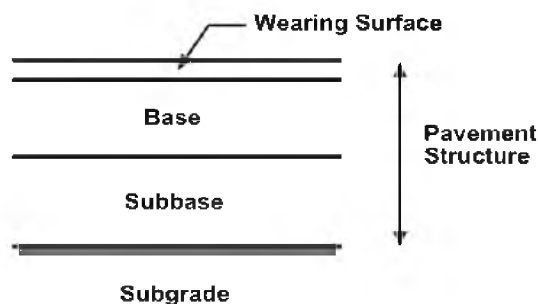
Typical Flexible Pavement Structure (Austroads 2009)
